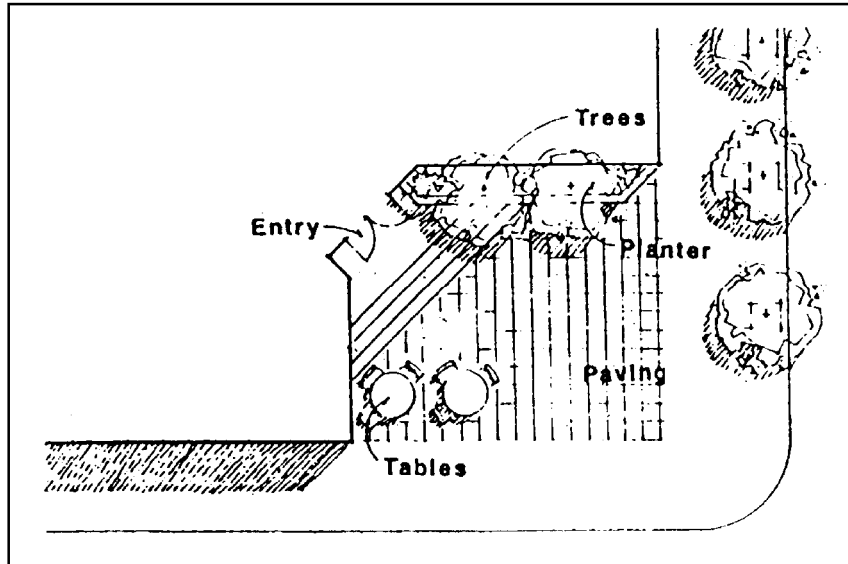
WEATHER PROTECTION ON GROUND FLOOR
